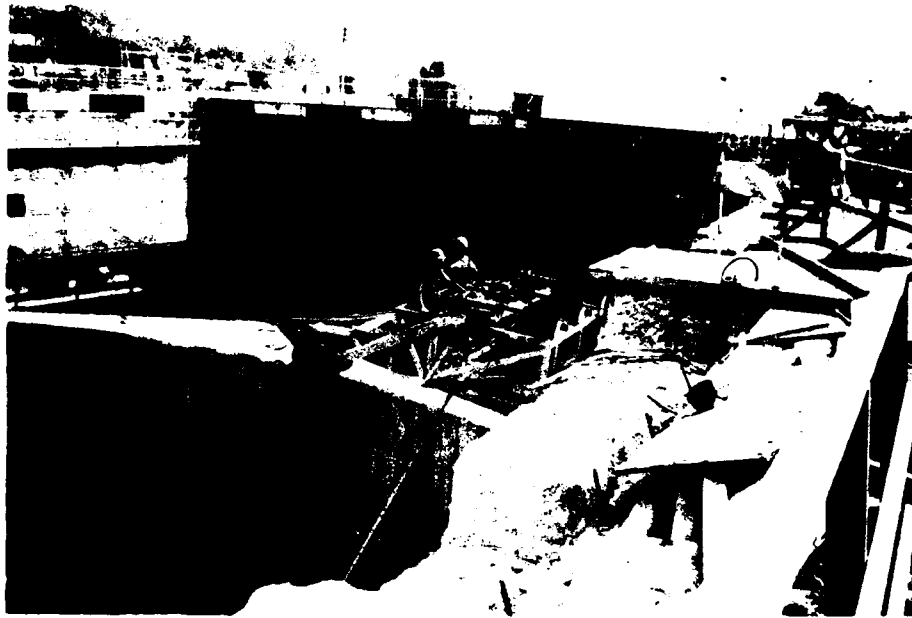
Drilling holes for dowels, Brandon Rock Lock remainder of the monoliths. Instead of the hooked bars shown in the plans (Figure 164), the contractor elected to use straight bars with a nut welded on the end. Dowels were grouted with FASLOC, a polyester resin grout manufactured by Dupont. Selected anchors, two or three per monolith, were load tested to 20 kips with the use of a hollow core hydraulic ram (Figure 173). Approximately 3,800 dowels were required to anchor the replacement concrete in the lock chamber resurfacing. The contractor's bid price for these concrete anchors was \$15 each as compared to the Government estimate of \$44 each.
